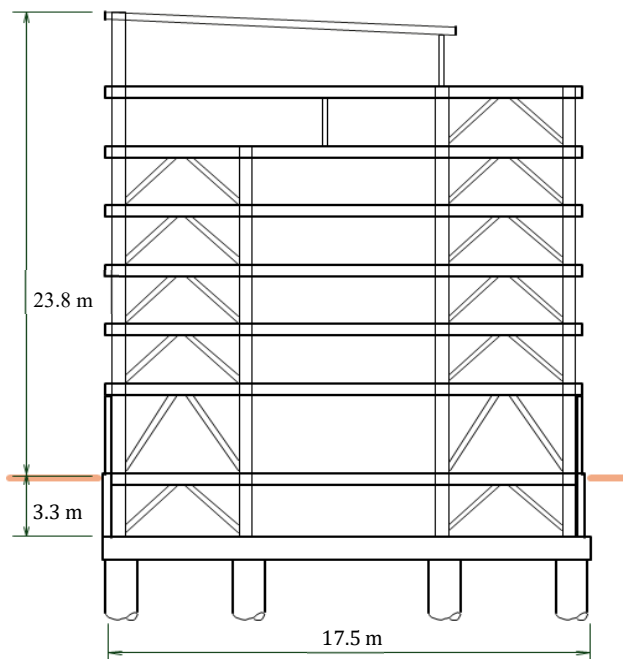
Schematic layout of typical transverse section of 7-storey building.
